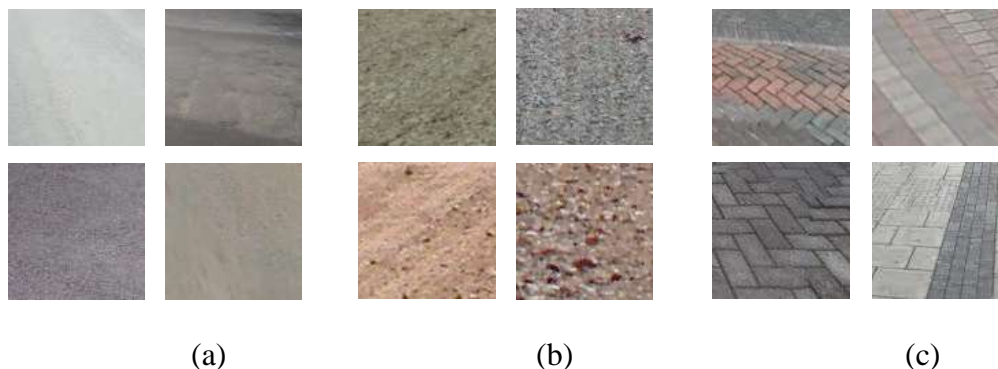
The type of surface object pictures was taken from (a) asphalt, (b) gravel, and (c) pavement road.
